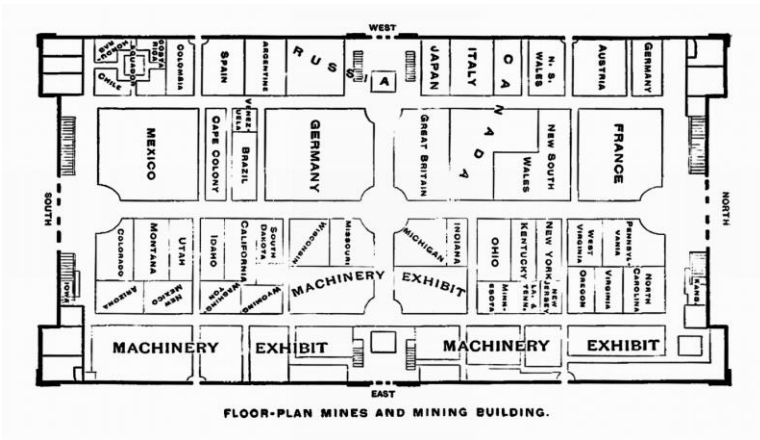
Floor plan of Mines and Mining building at the 1893 Chicago Exposition. From Dibble Publishing Company (1893:39).
